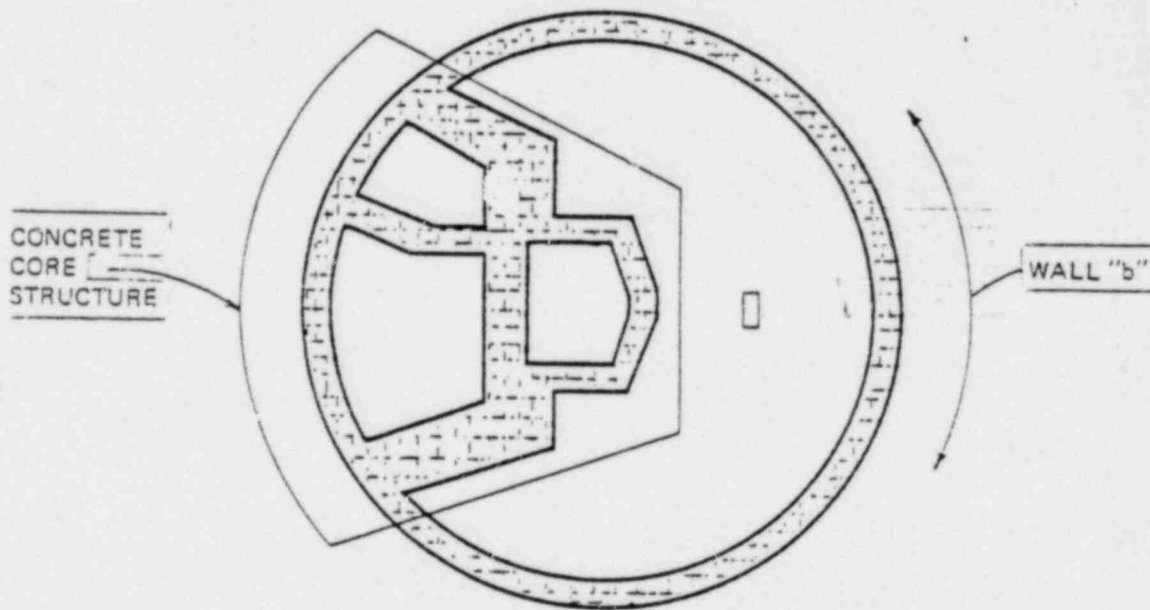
PLAN VIEW BETWEEN BASEMENT AND FIRST FLOOR LEVELS, CASE 1B
